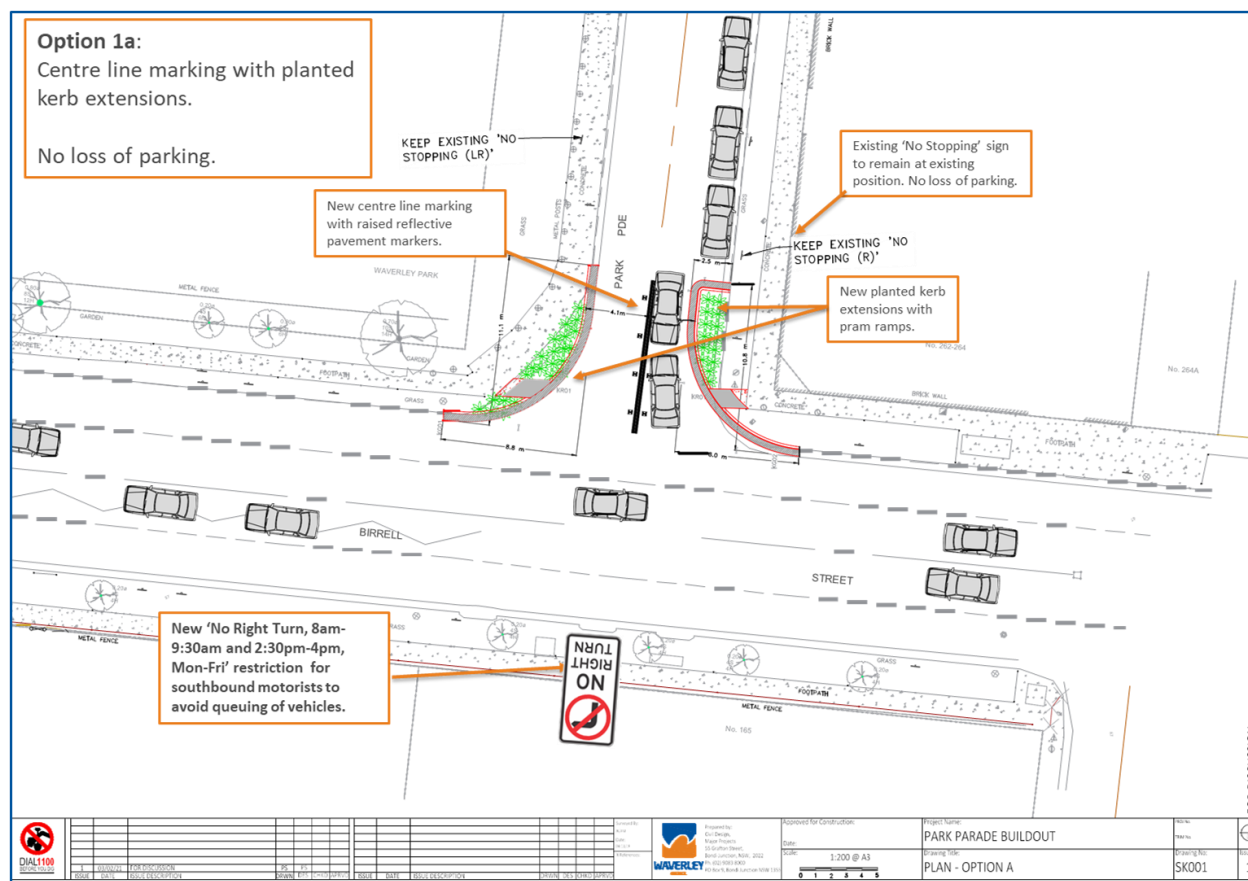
Park Parade intersection with Birrell Street – Recommended treatment design.
